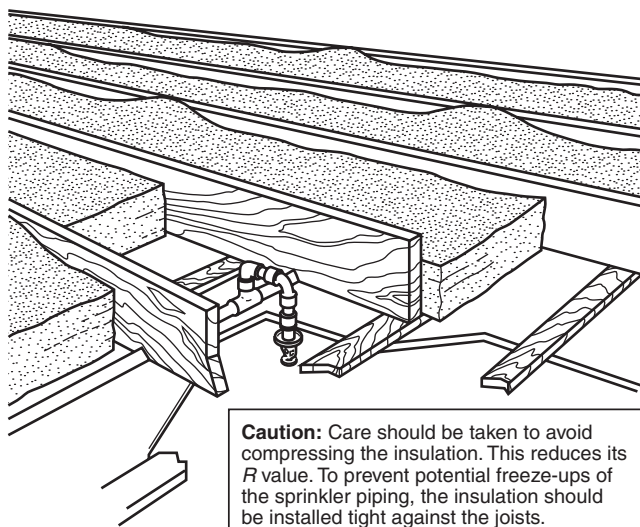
(e) Insulation Recommendations — Arrangement 5.
